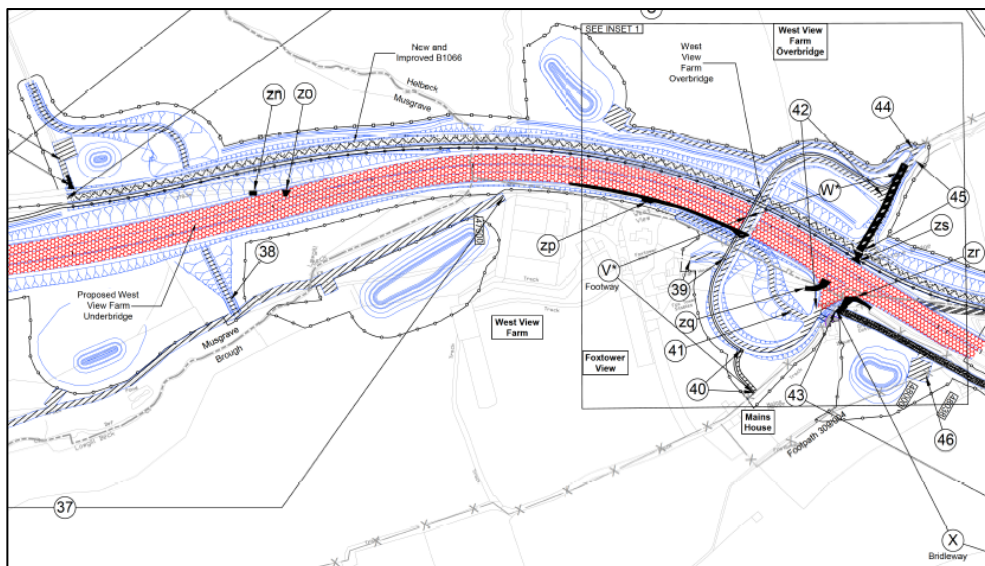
(c) Extract from RoW & Access Plans (Before)
